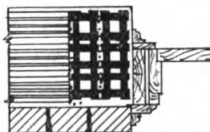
Section through door jamb showing use of closure tile in connection with brick faced hollow tile wall.
